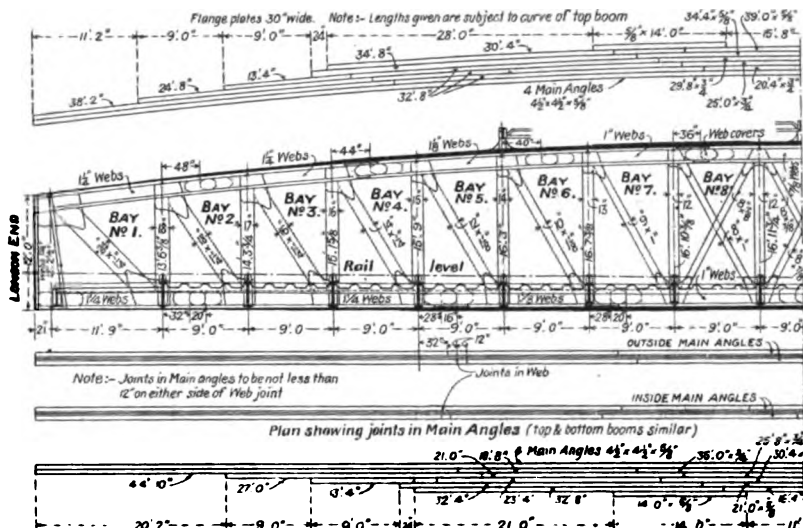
Bridge over North London R. Half Elevation of North Girder.
